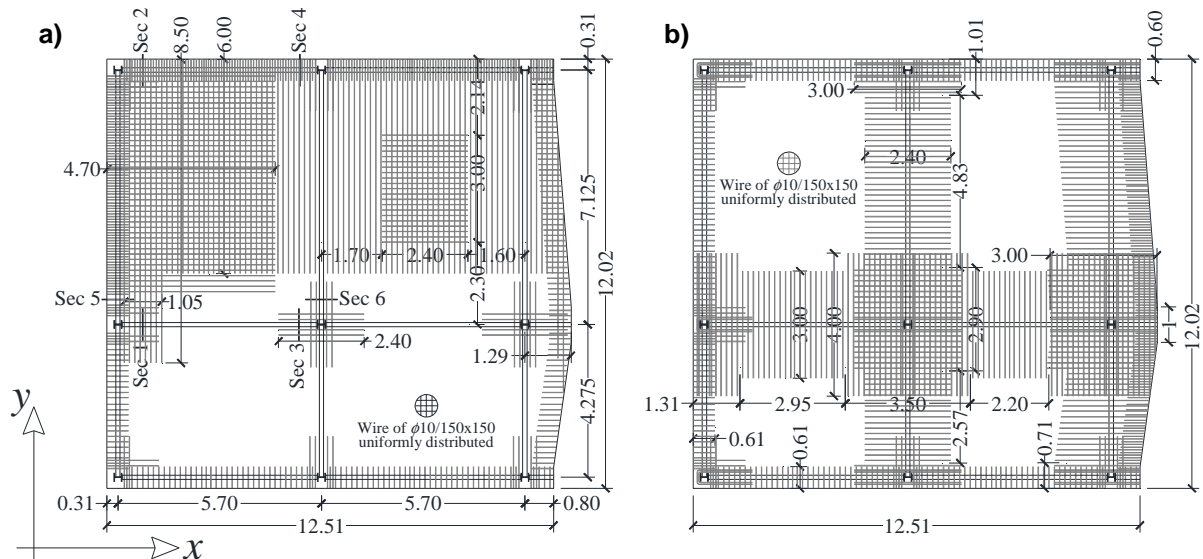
‘Asymmetric’ structure. Slab reinforcements. (a) Lower layer; (b) upper layer (dimensions in m)
